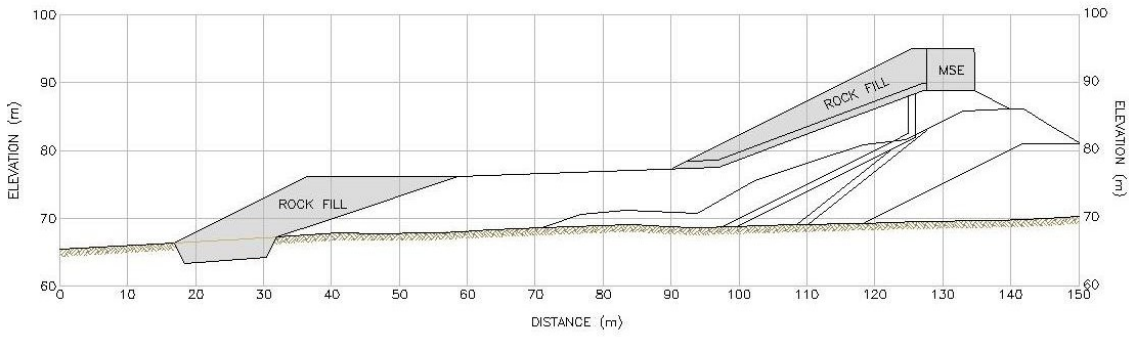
Typical Section of the Cerro Santa Rosa tailings dam showing each phase of development.
